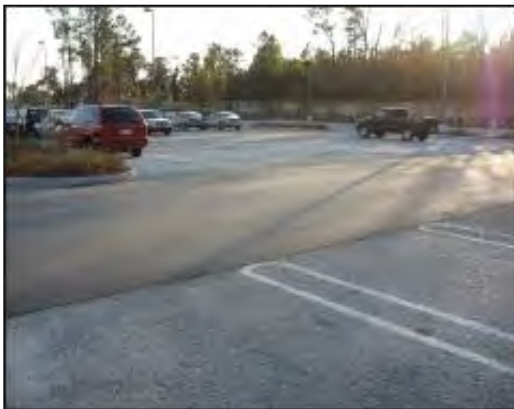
Example of Permeable Concrete Parking Stalls (New Hanover County & City of Wilmington, 2008)
